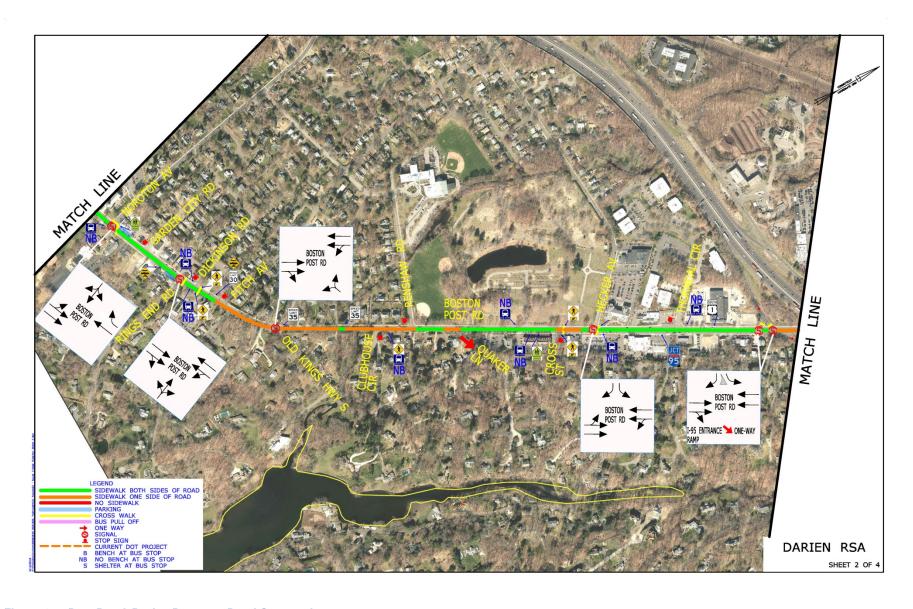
Post Road, Darien Route 1 - Road Geometrics
